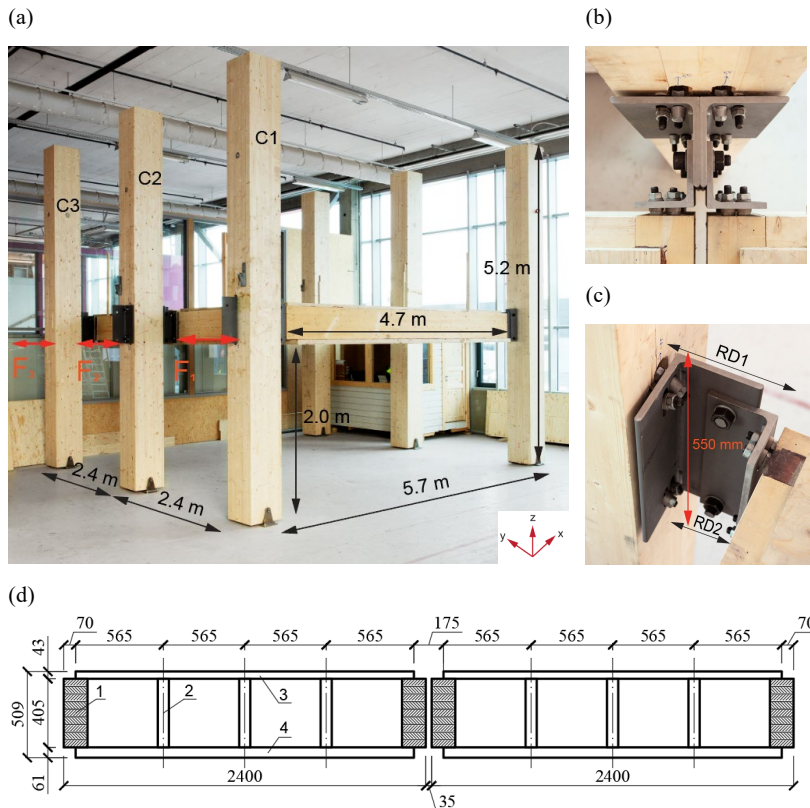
The mock-up frame assembly set-up. (a) over-view of the construction, (b) connection between floors and centre columns (C2), (c) connection between floors and edge columns (C1 and C3), (d) cross-section of the floor elements. Photo (a), (b) and (c): SINTEF/A.-L.Bakken
